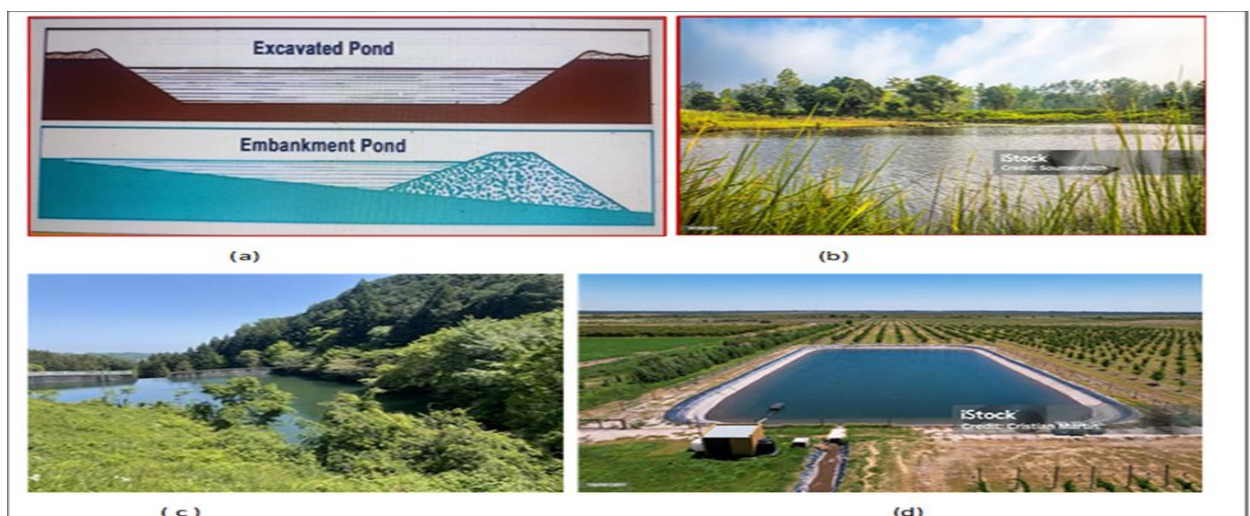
(a) Excavated & Embankment Pond (b) Surface Pond (c) Off-Stream Pond (d) Plastic Lined Pond
